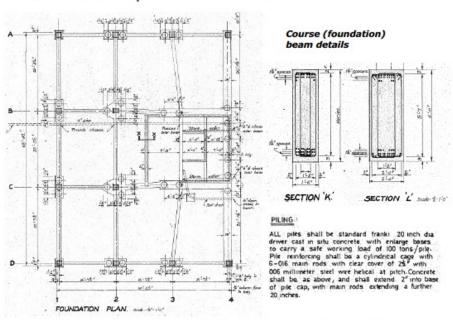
Foundation system. Left: foundation pan view; right: course beam details and piling information
